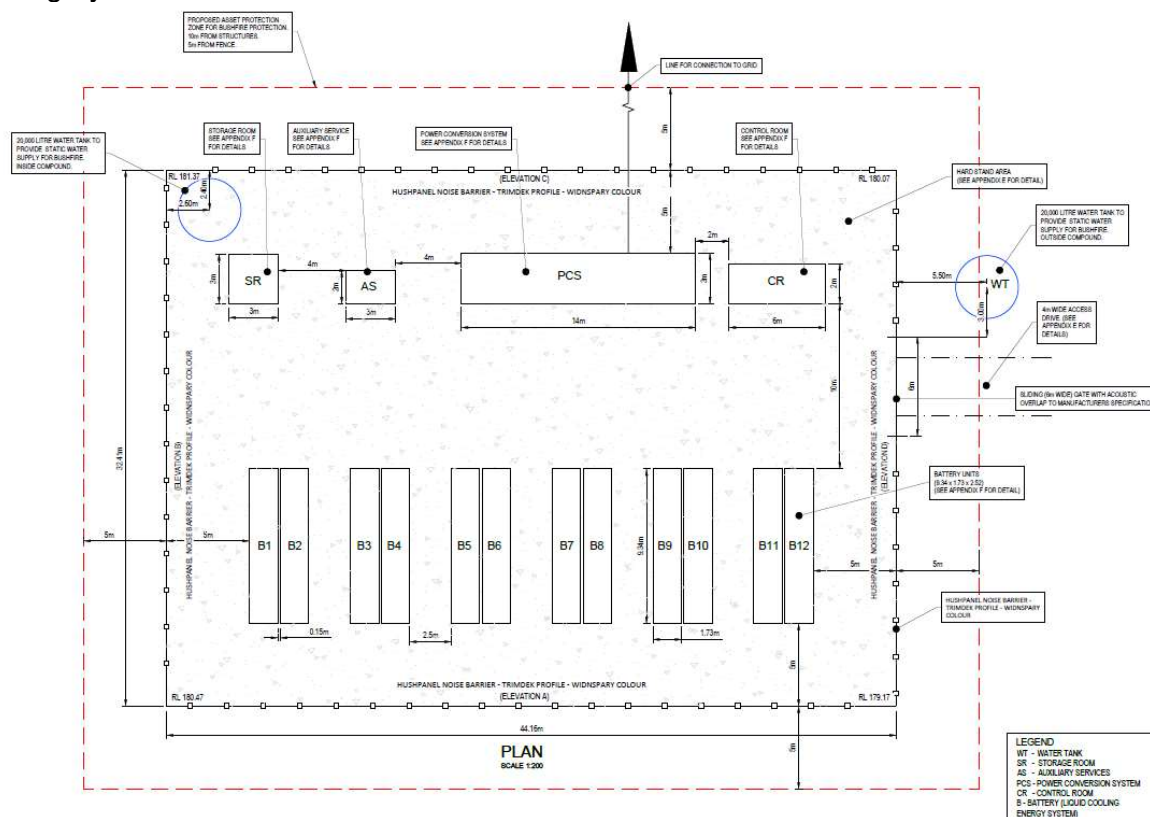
(Compound Layout Plan, Source applicant proposed plans)
